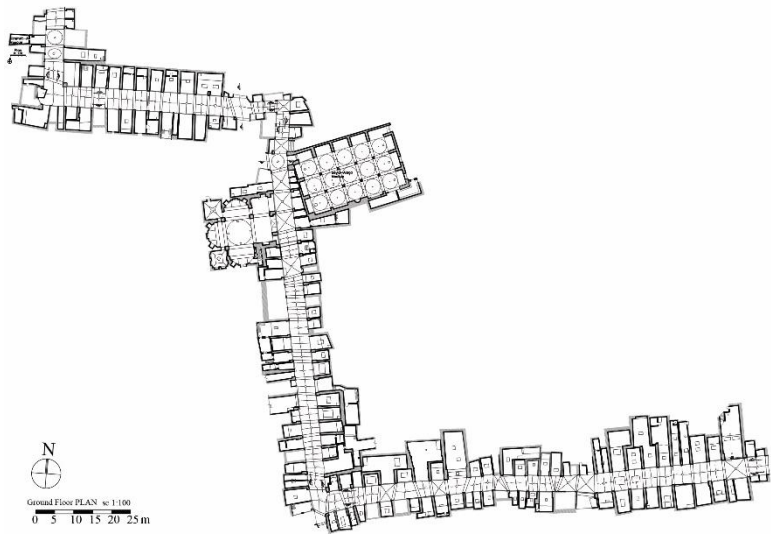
Davachi / Shotorban Bazarchasi Ground Floor Plan
